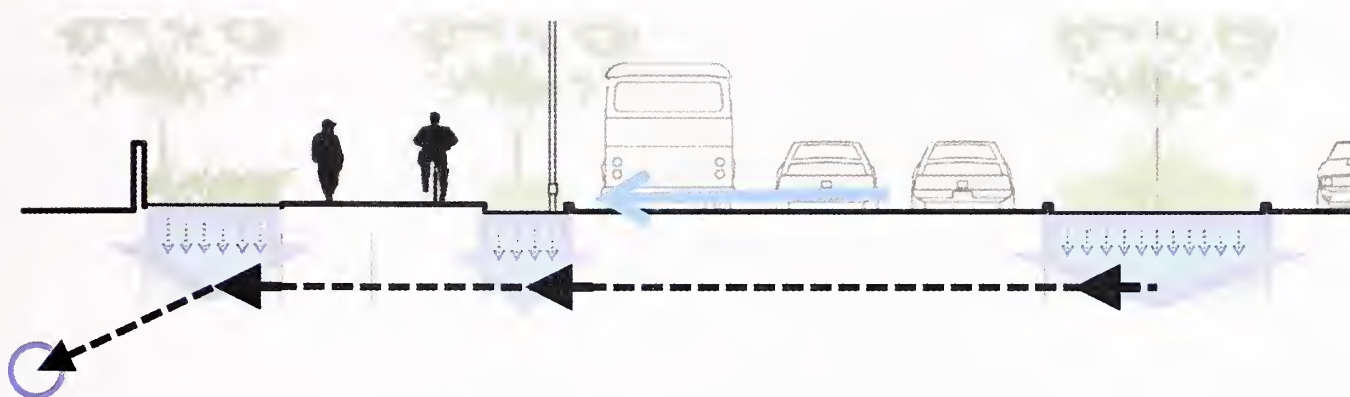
(iii) (a) Cross Section of Typical Road Side Detail Showing a Retro Fit Option for Storm Water Management Facilities
